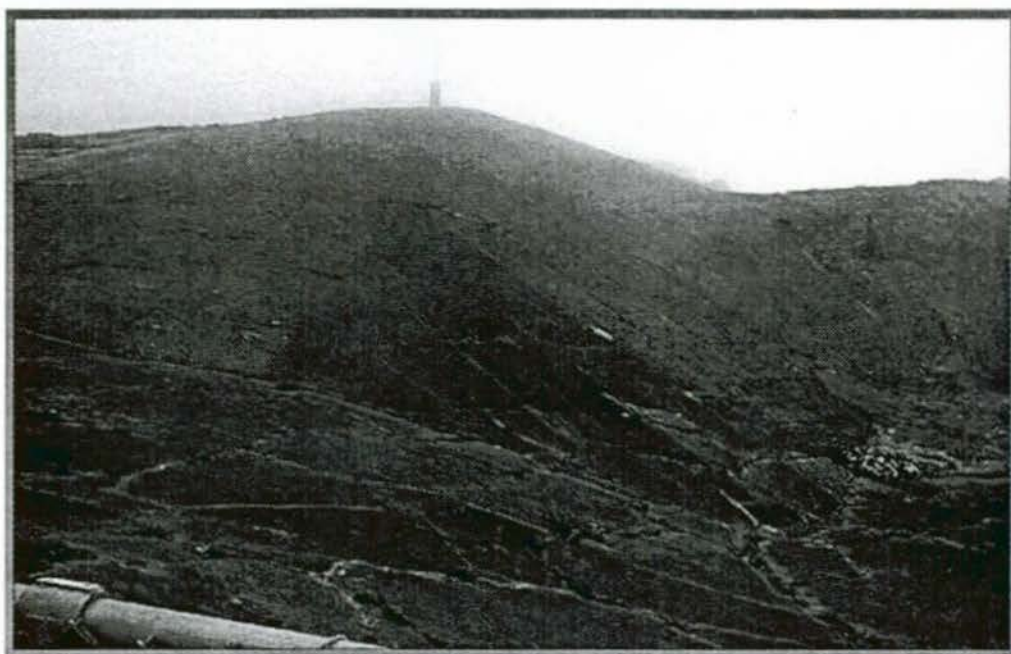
Southwest view of watershed illustrating severe cracking of concrete and plant invasions at cracks.
